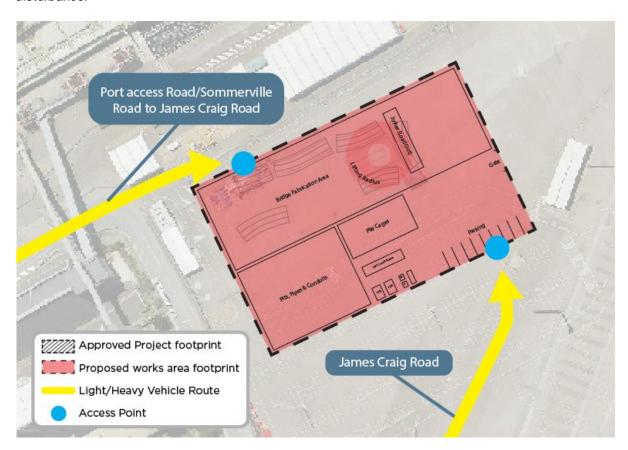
| Indicative site layout (Source: Glebe Island Construction Ancillary Facility Modification Report, TfNSW, 2020)
